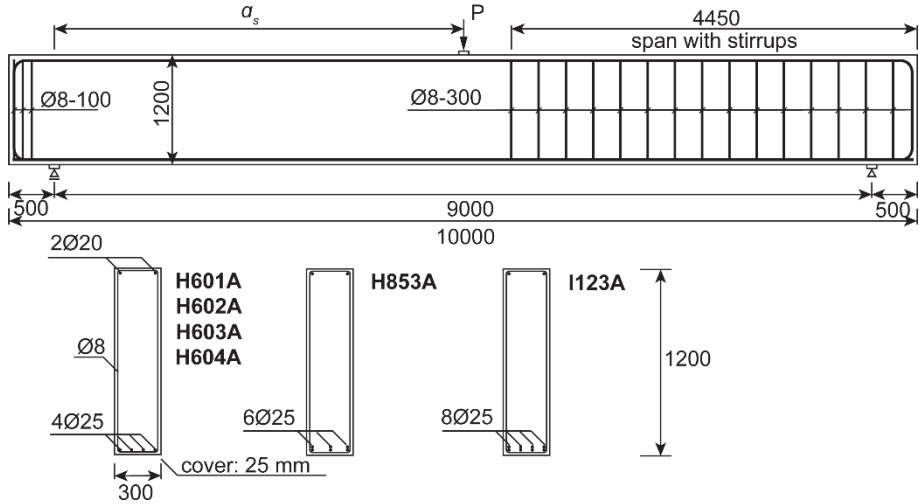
A sketch of beam configuration including beam dimension, reinforcement layout and locations of supports and load.
